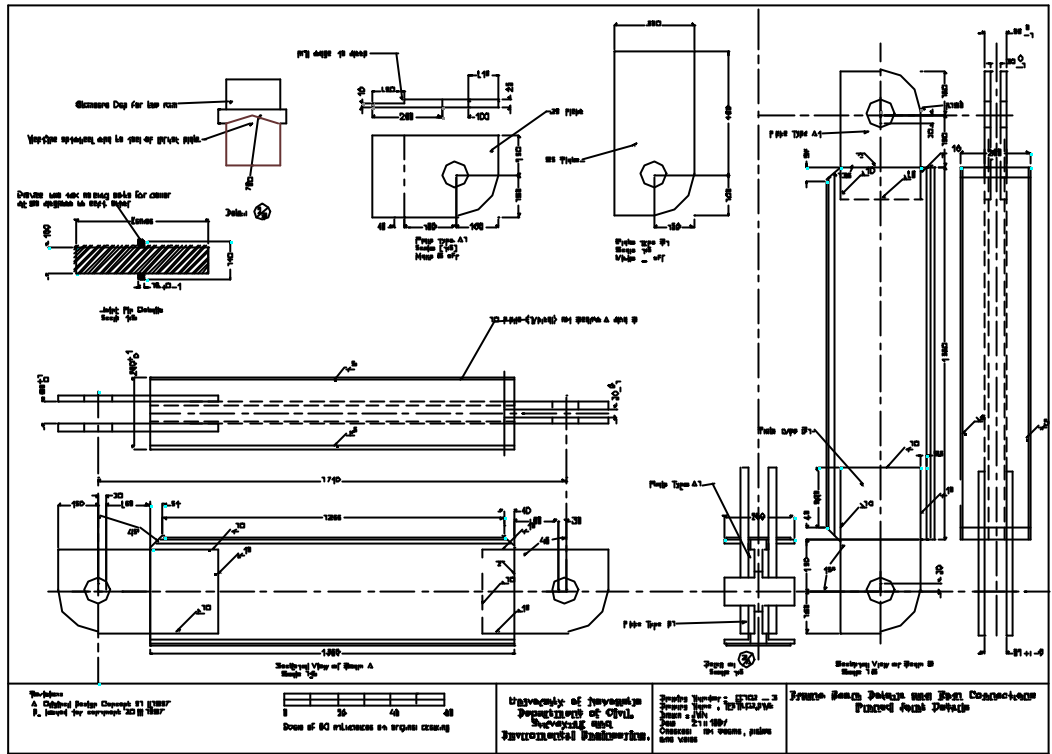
EF102 - 3 FRAME BEAM DETAILS AND RAM CONNECTIONS, JOINT DETAILS
